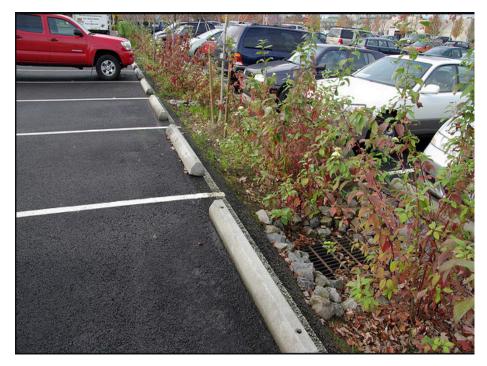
B; Detroit Flats Road Treatment Suggestions
